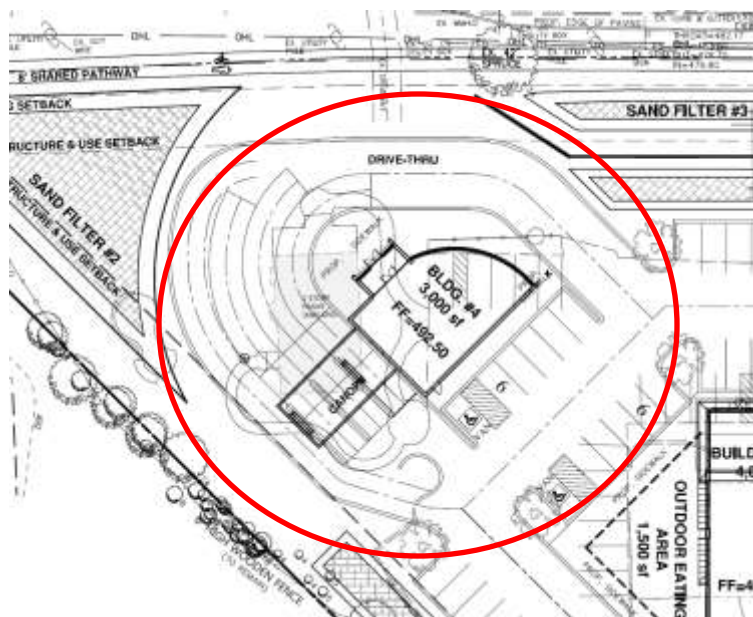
Proposed site plan showing demolition of historic house and construction of new building
